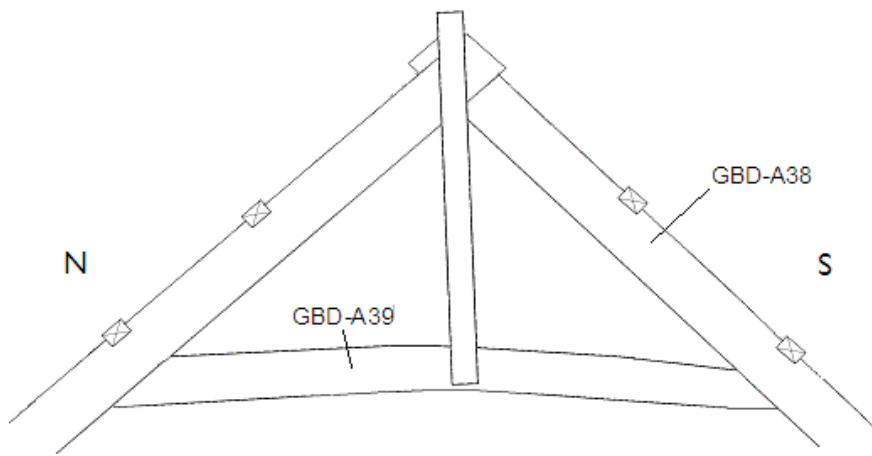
Central range; sketch of truss 1, showing the location of samples GBD-A38 and GBD-A39
